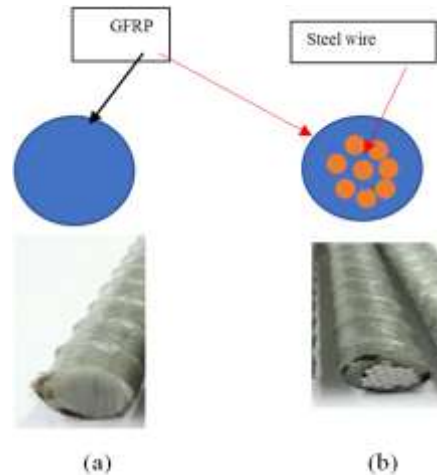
Cross section types of “FRP Bar”; Type (a) (GFRP bar); Type (b) (GFRP with steel wires).
